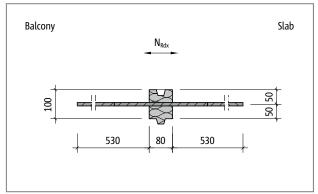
Schöck Isokorb® T type H-NN2: Product layout
